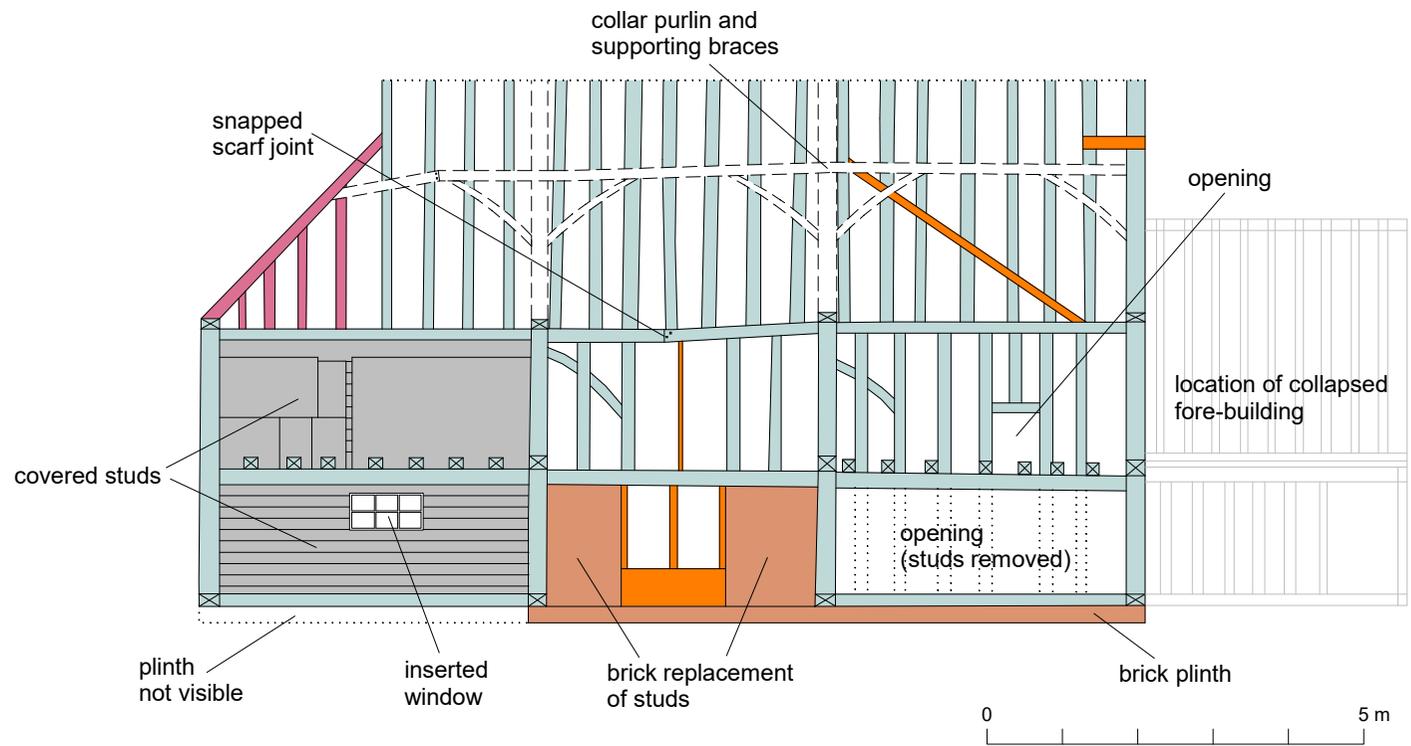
Frame drawing of the east wall of the barn, indicating the locations of original, re-used and replacement timbers.
